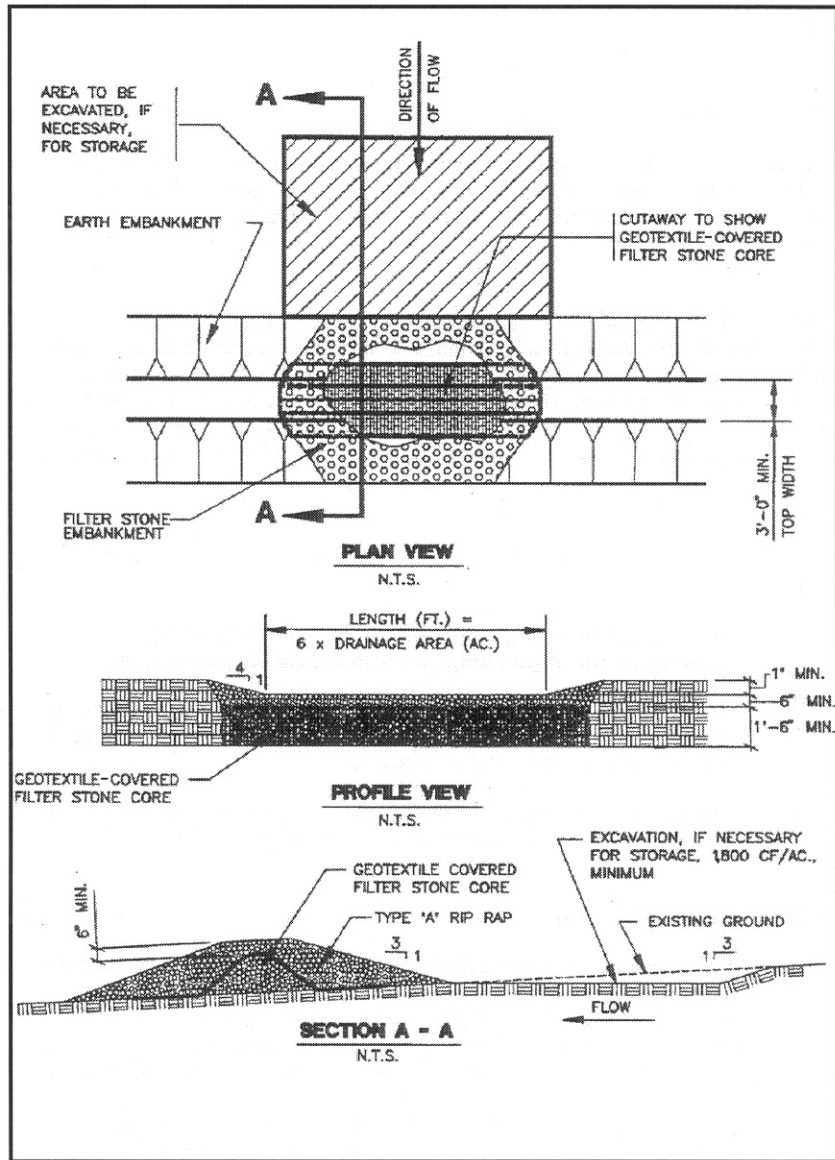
Stone Outlet Structures Installed with a Sediment Trap
